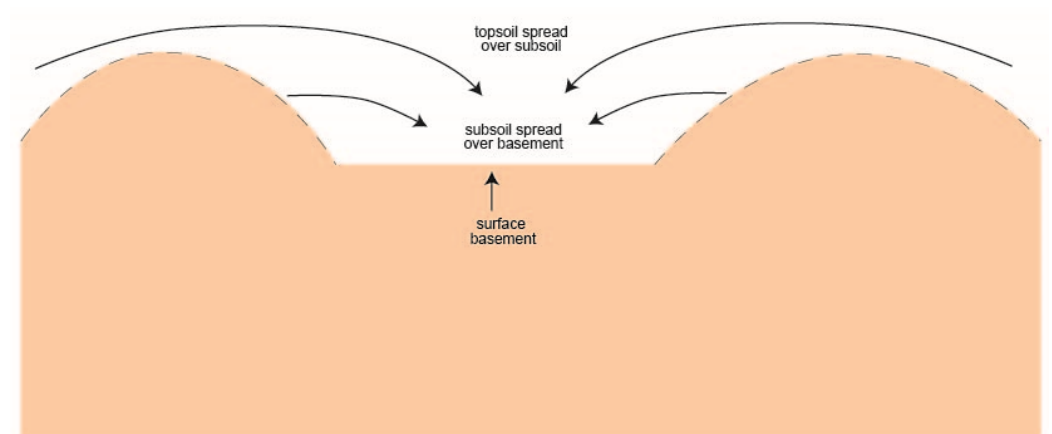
Cross section of the Dawson dam showing the spreading of the dam wall materials over the reformed basement
